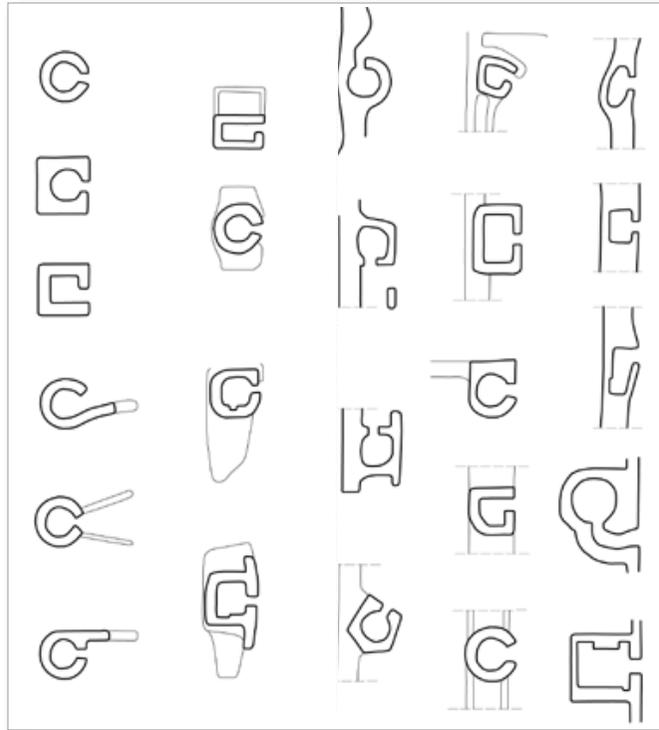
Possible layouts of corbelled domes; free standing, close to or upon dividing stone walls, with rear side to crag rocks
